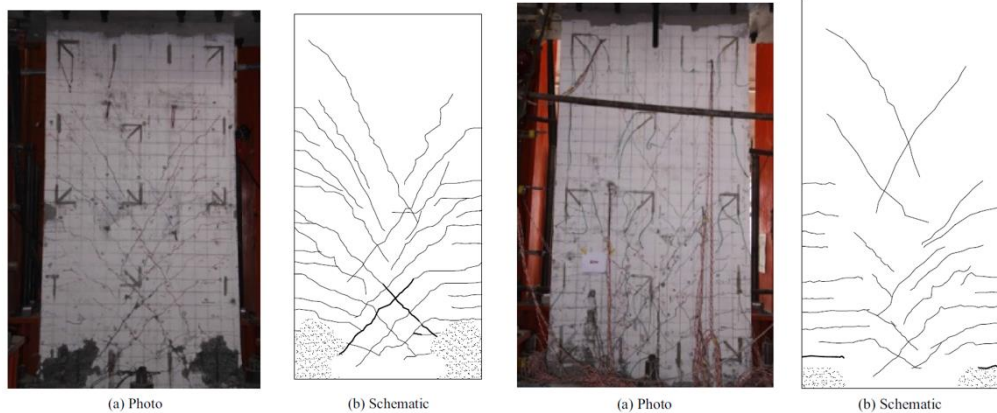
Photo and schematic crack patterns of the specimen SW1.
